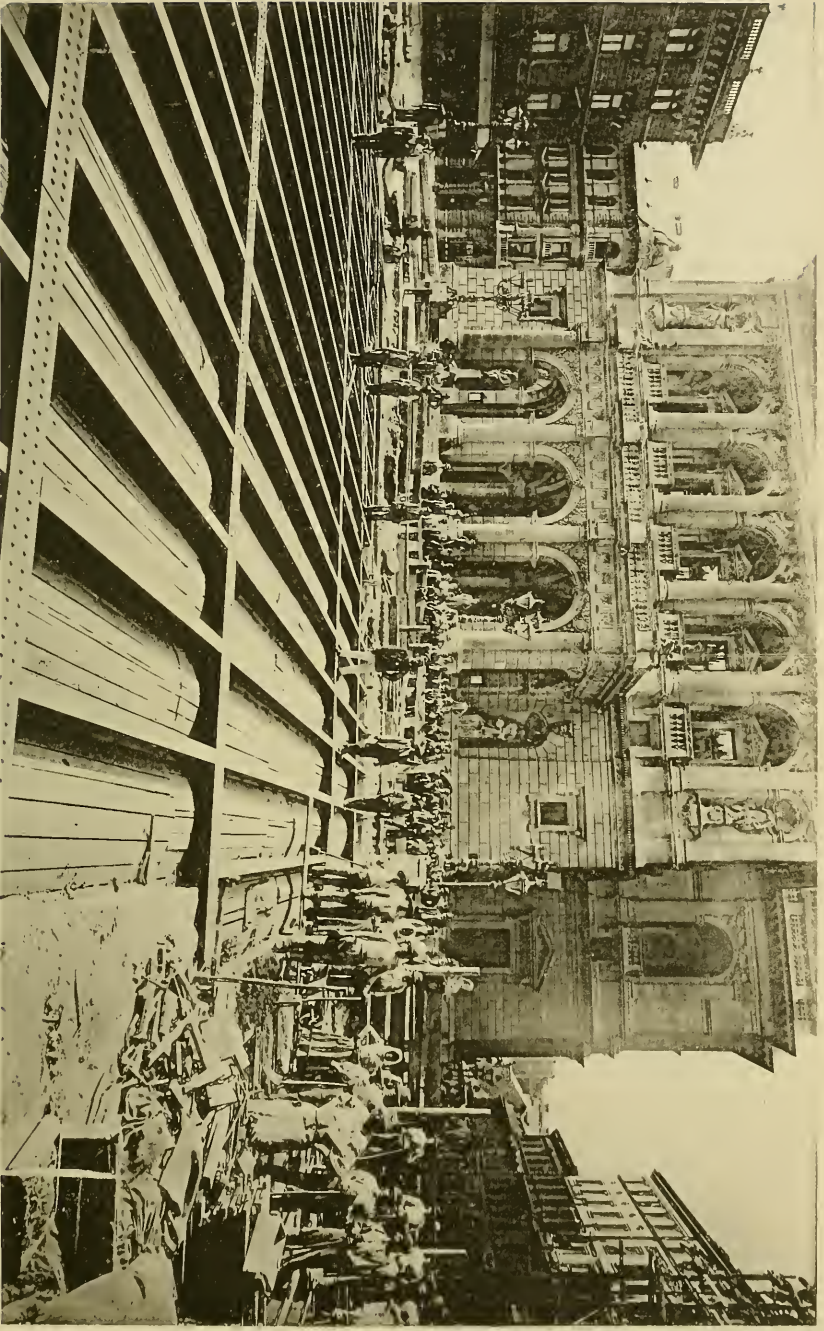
ROOF FOR OPERA-HOUSE STATION, UNDER ANDRASSY STREET, BUDAPEST SUBWAY.
